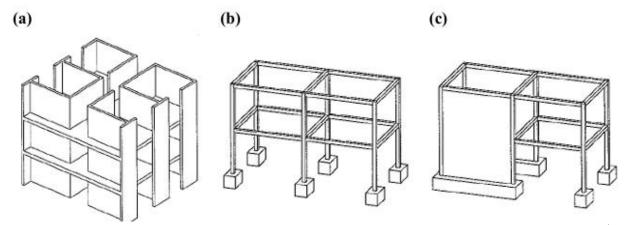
a) Wall System Building, b) Frame System Building, c) Dual System Building; figures from Arie, G (2003).4
